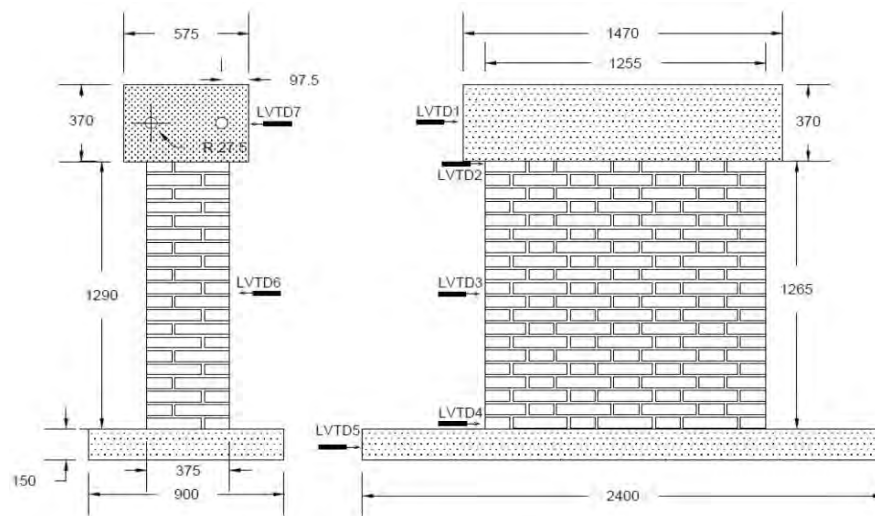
Dimensions of specimens for cyclic test and arrangement of LVDTs transducers.
